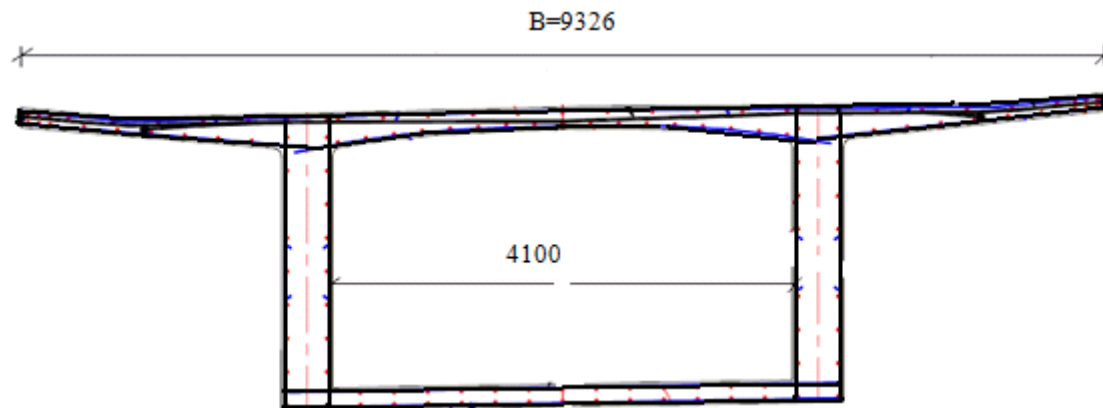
Cross Section of box-girder the Källösund Bridge. Adapted from Puurula (2004)
